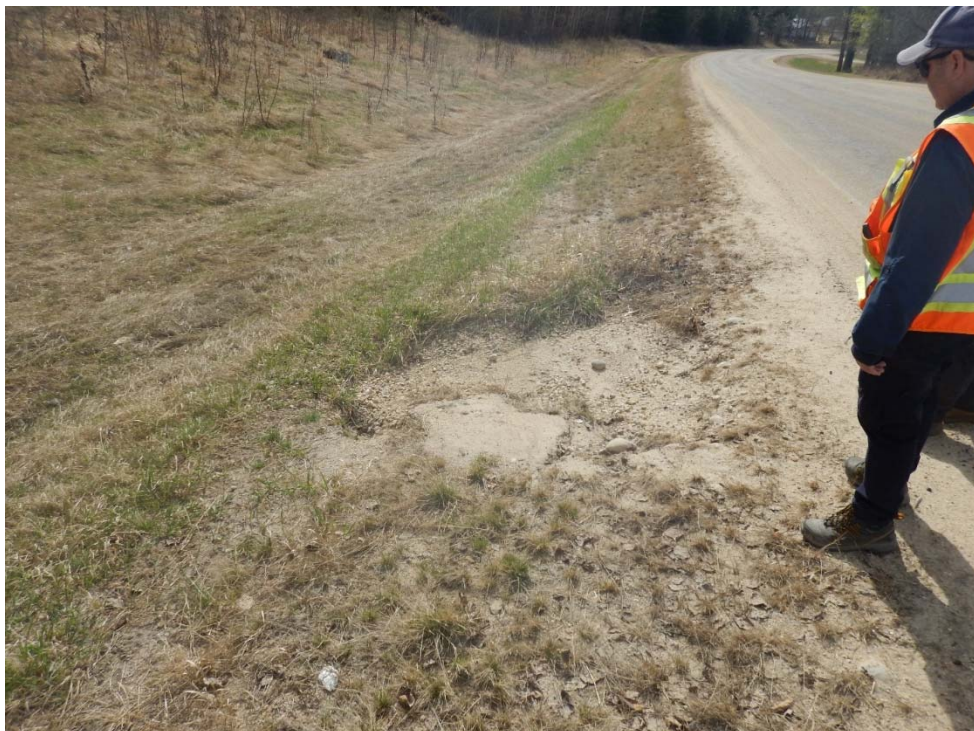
Looking at the slight drop/settlement development near the edge of the road
